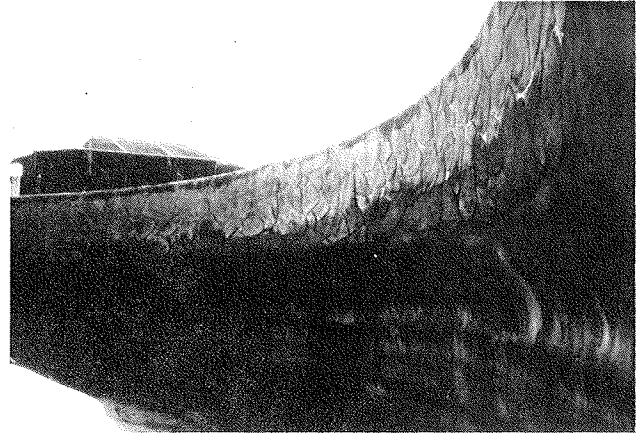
Photograph of Sequoia Park Zoo cantilever Welded Wire Wall.
